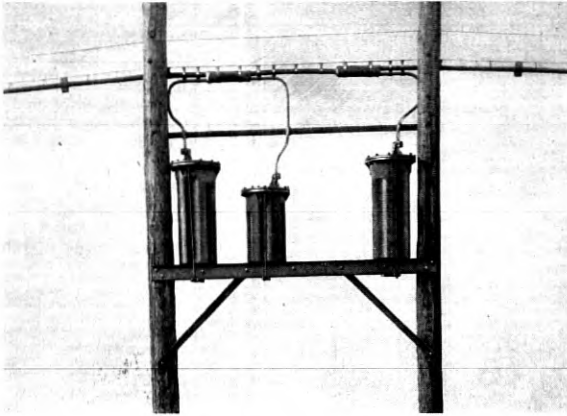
Installation of aerial toll cable loading on 4-case "H" fixture
